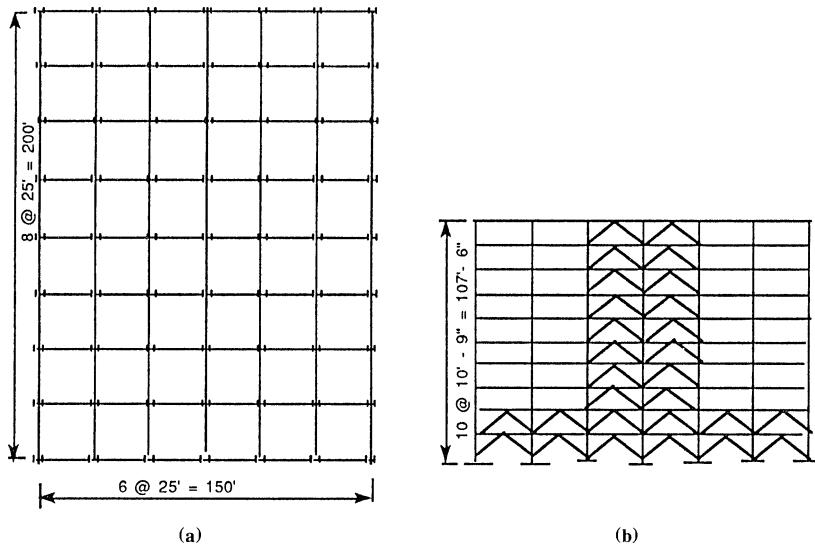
Ten-story building for seismic design. (a) Plan. (b) Elevation N-S.
